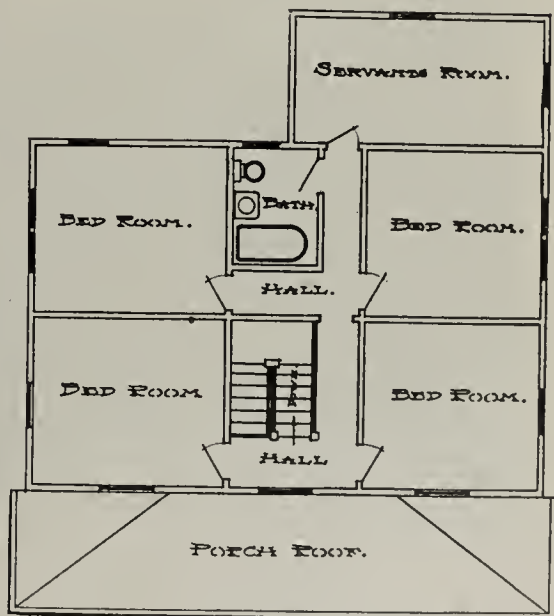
The second-floor plan of the same house, which will comfortably accommodate from ten to fourteen patients.
